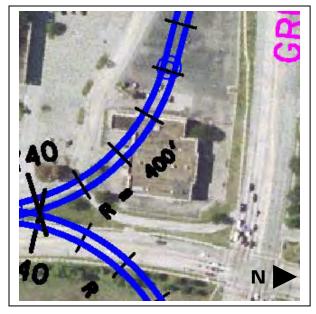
Office Building at Greenspoint Drive & Greens Road
